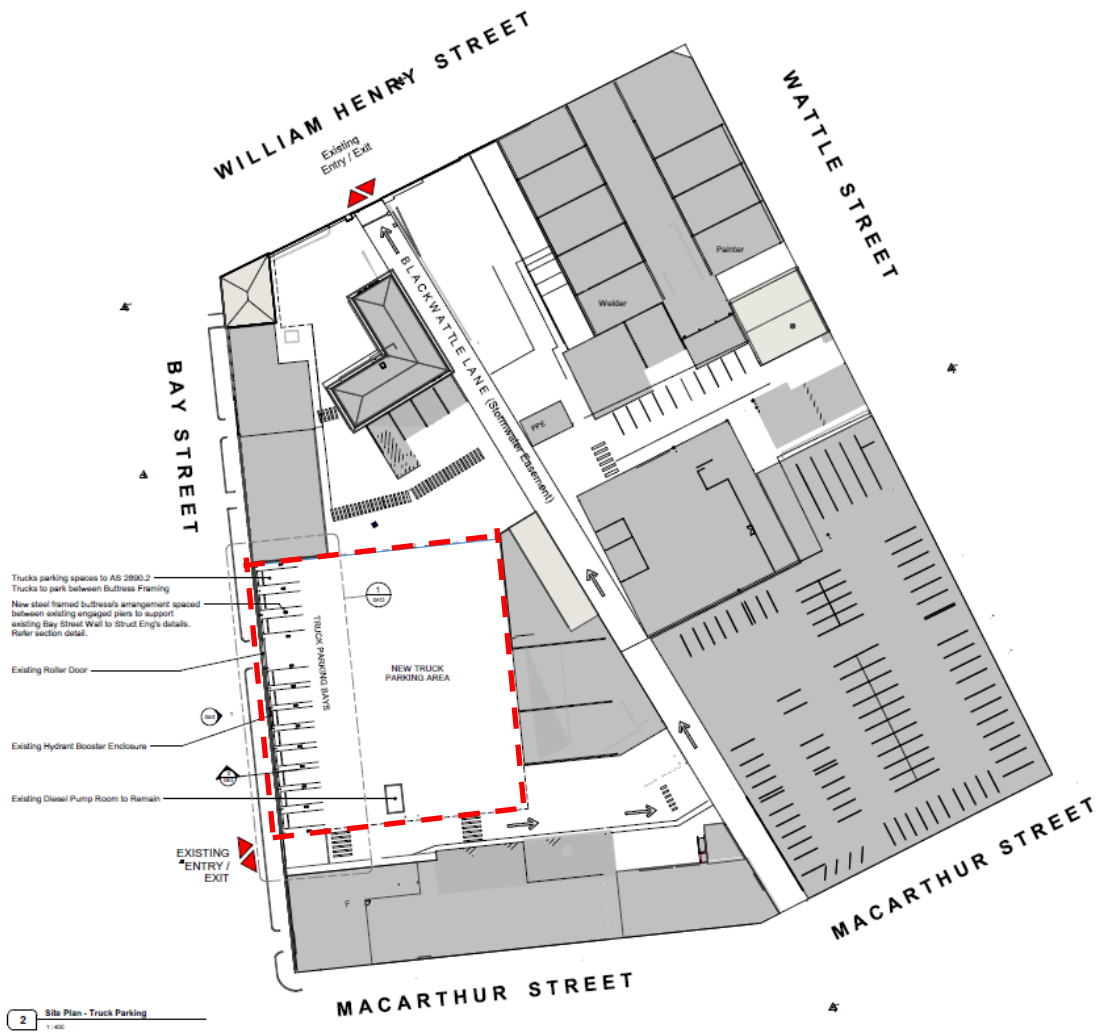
The proposed site plan with the truck parking area indicated by the red hatch
